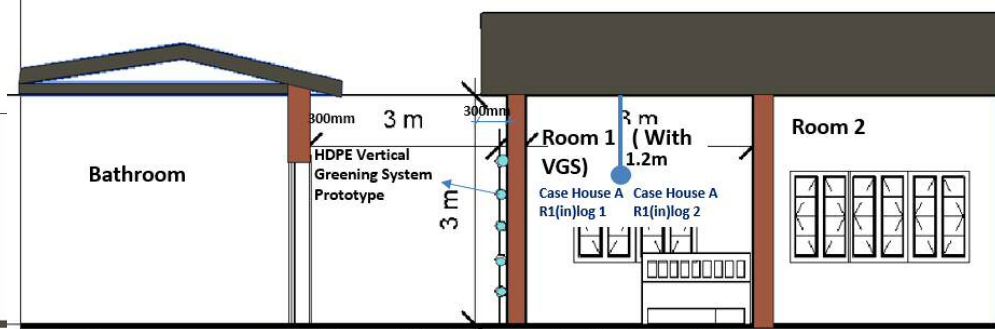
; Location of loggers in Room 1 in Case House A, source: Author, 2014
